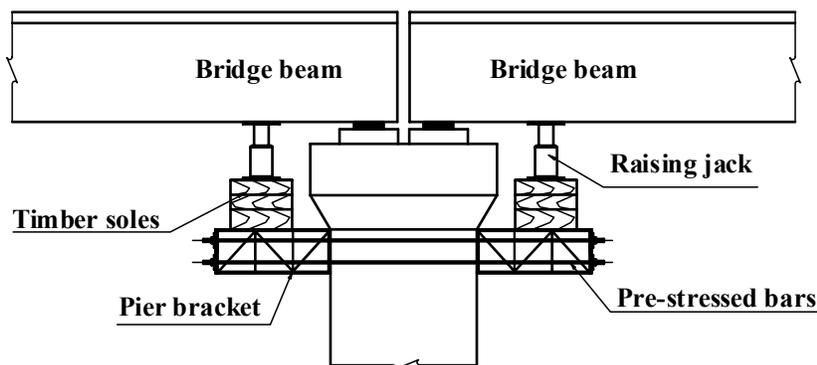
Bridge beam raising solutions by solution of jacks set on pier bracket
